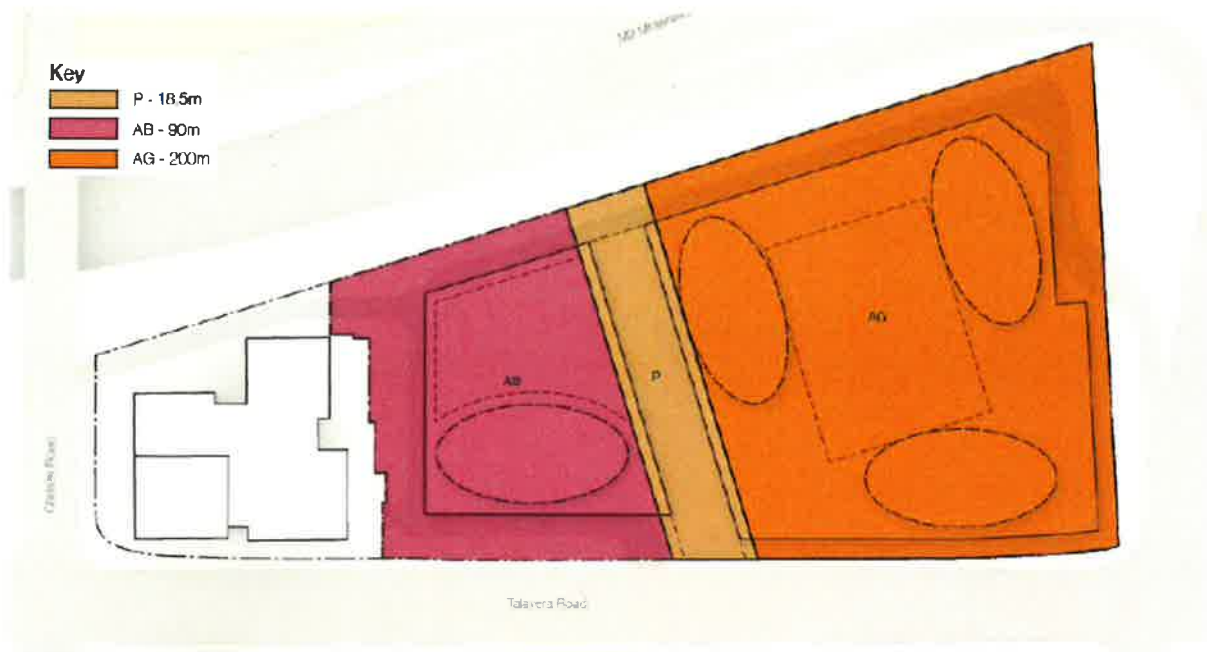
Extract from planning proposal depicting proposed height of buildings map.
